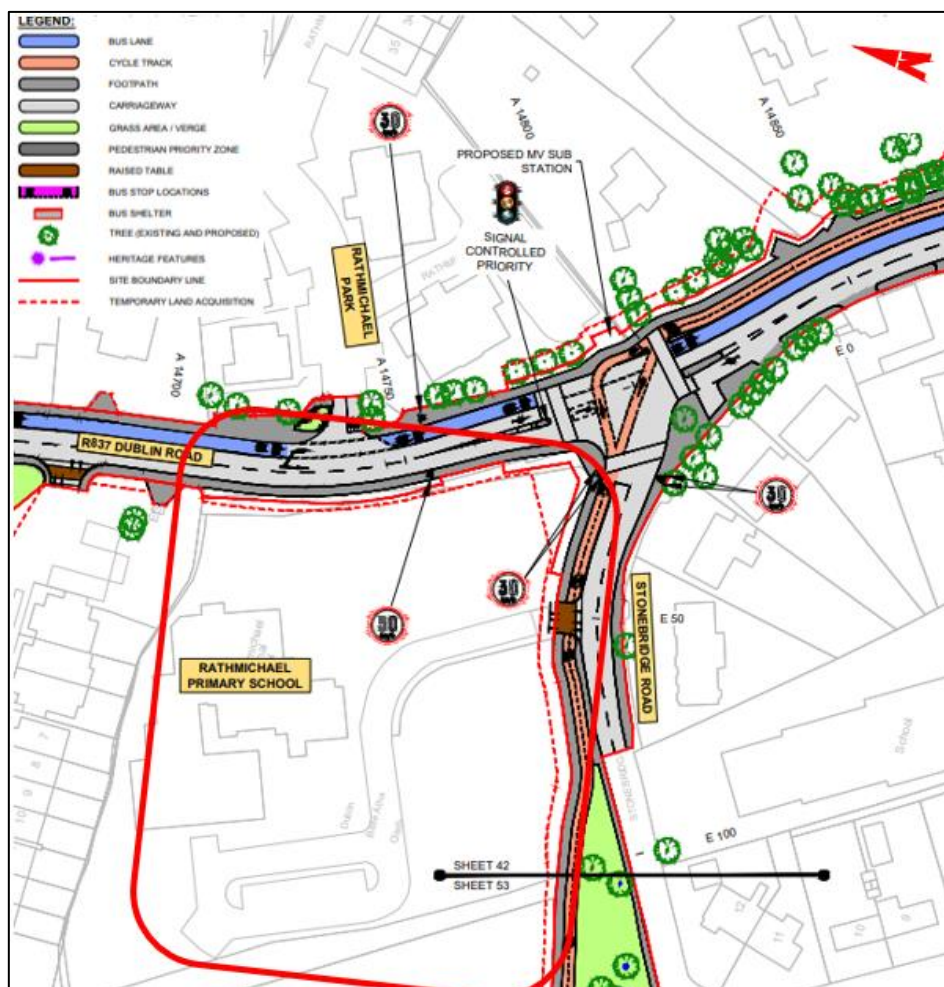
Extract from General Arrangement Drawing at Dublin Road & Stonebridge Road (Sheet 42)
